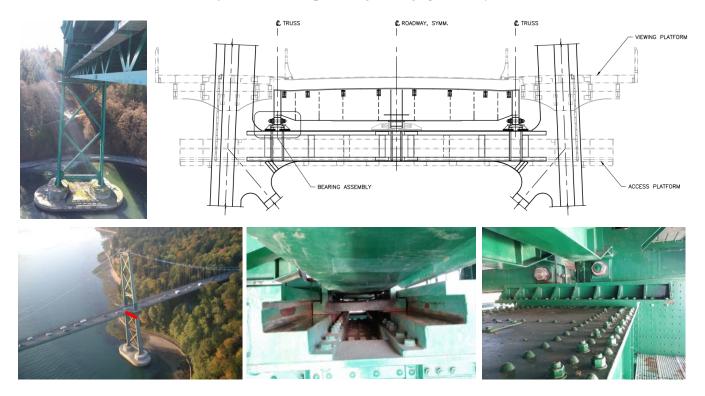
Clockwise from bottom left: Aerial view of south tower with tower strut highlighted in red; view of south tower from below deck; view of tower segment from drawings showing tower strut deck diaphragm, truss bearings; bearings within bearing guides supported on top of tower strut; previous deteriorated bearing shoe within bearing guides.
